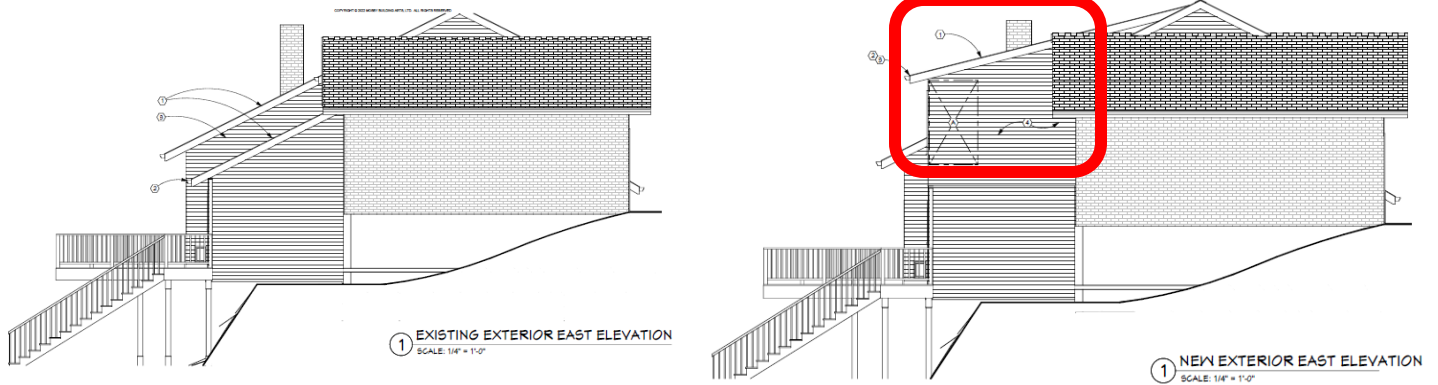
Existing East Elevation (left) and proposed addition (right) in red.
